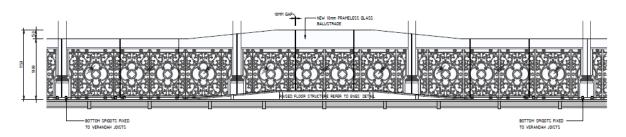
Proposed elevation of the proposed glass balustrade showing the height increase due to the ramp. Source: CCG Architects, 2022.
